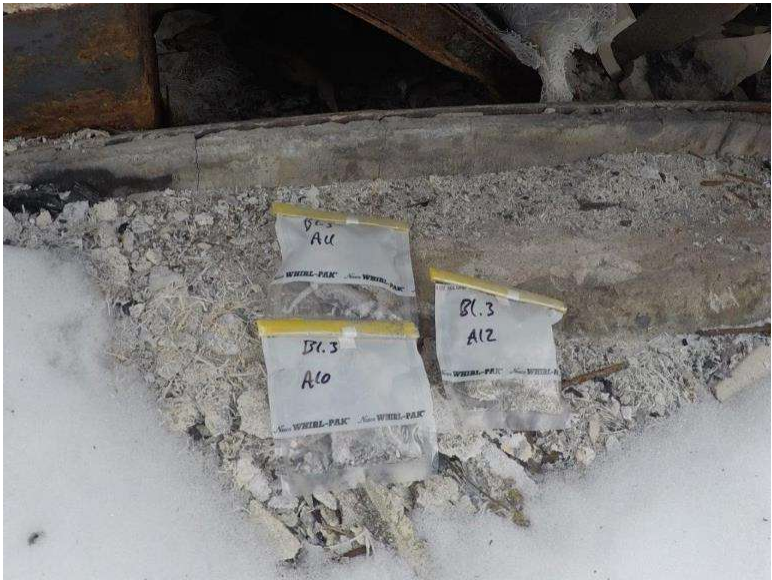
Site 1.4 Crandell Campground Washroom 2 Asbestos Samples 1.3-A1 to 1.3-A3, None Detected.
